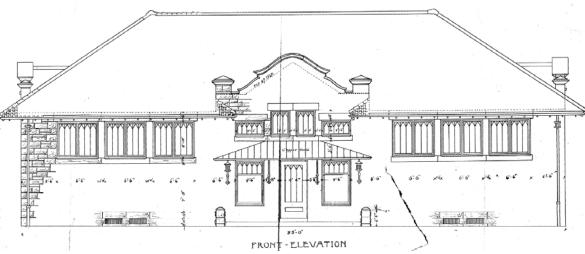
Front elevation of the Old Bookstore, as originally designed in 1905, which illustrates stone walls and a copper hood over the main entrance. Source: Stanford University Architect Office.
